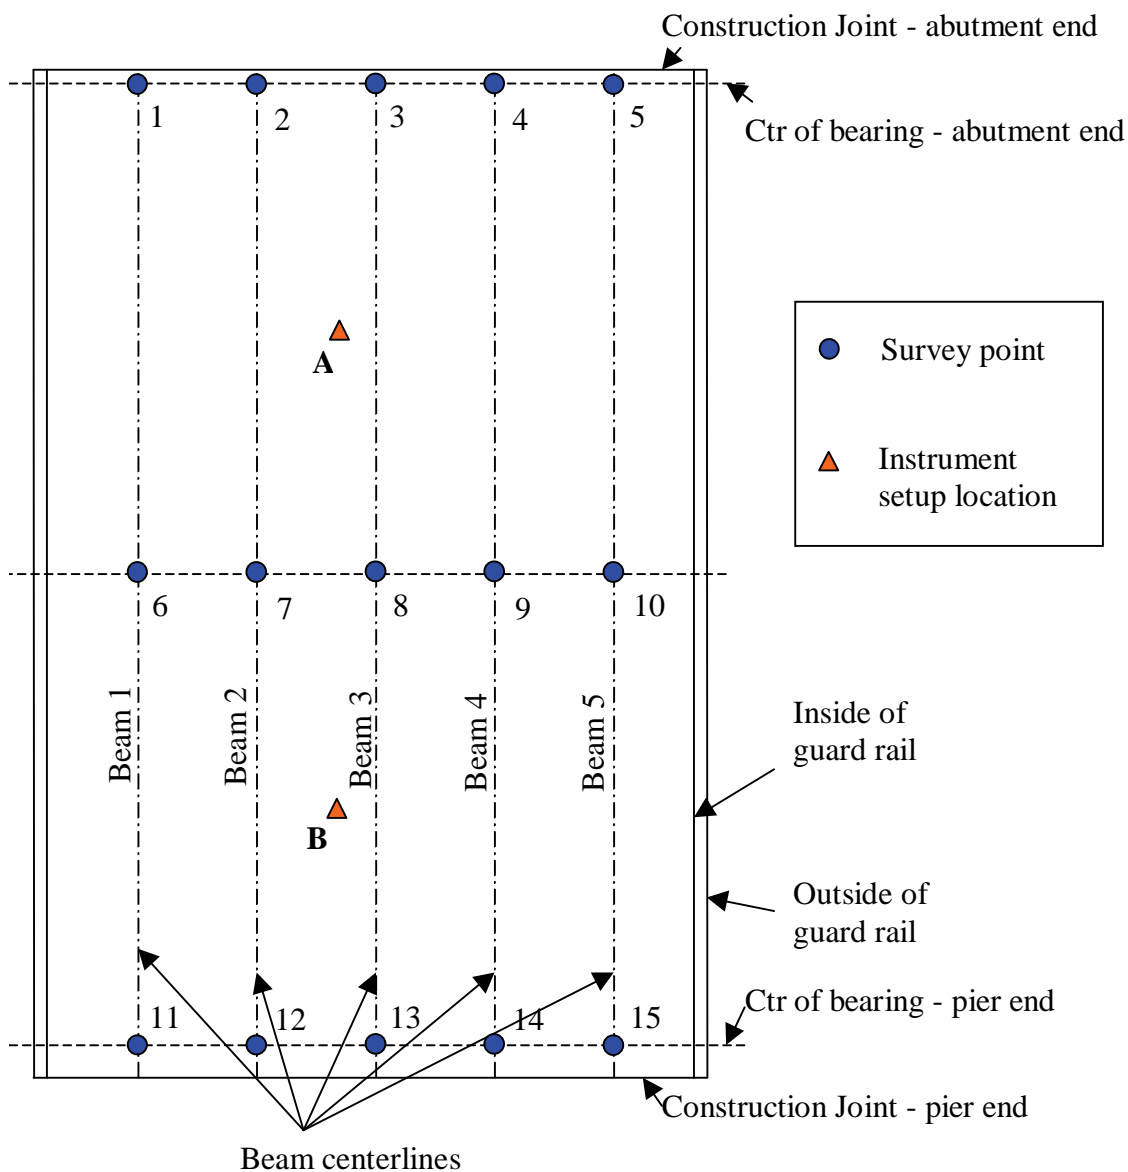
Typical Precise Surveying Scheme for a San Angelo 5-Beam Span
